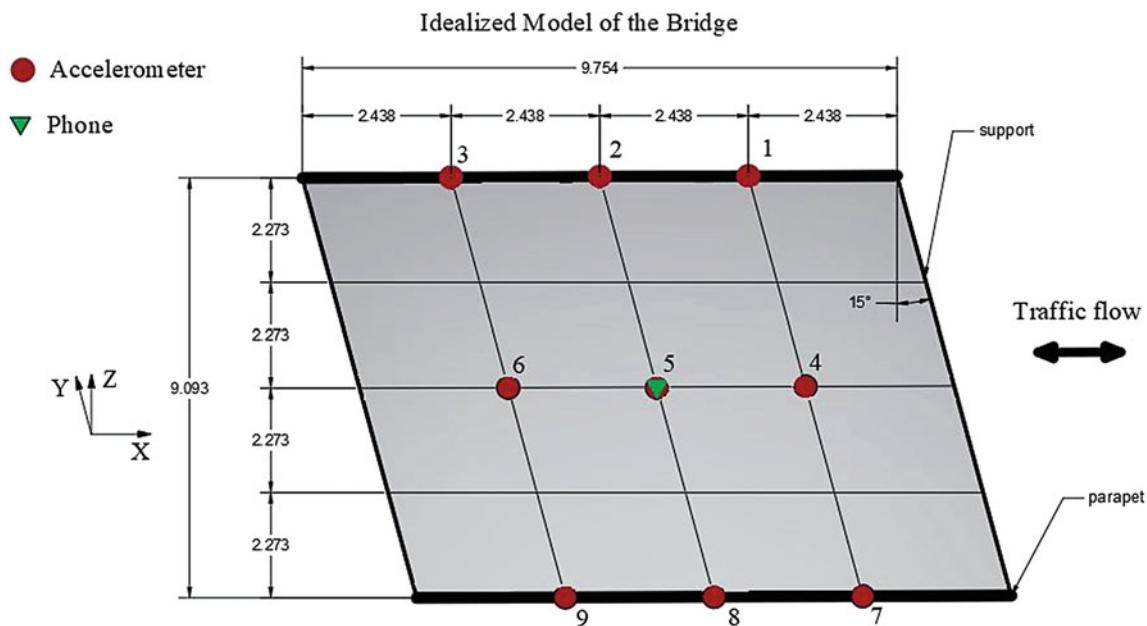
Sensor instrumentation plan for one of the slab bridge span with two setups (all dimensions are in meters)
